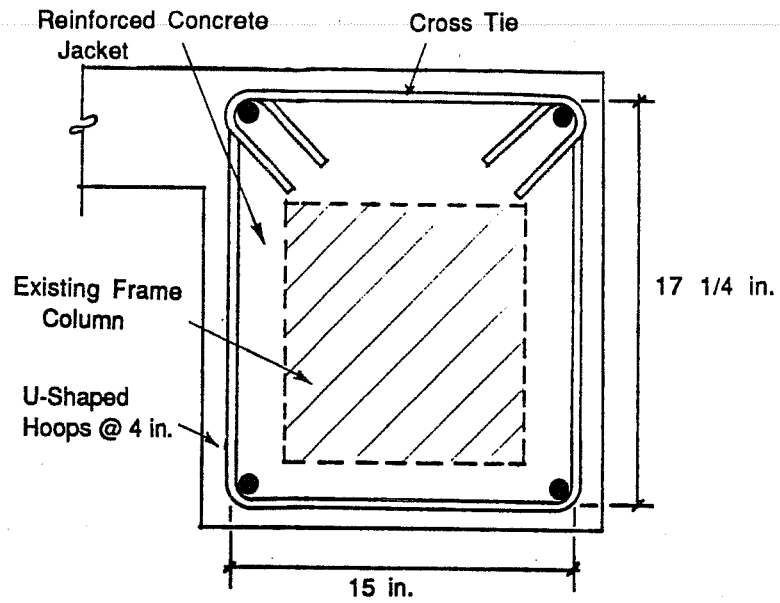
Boundary Element-Transverse Reinforcement in Column Region
